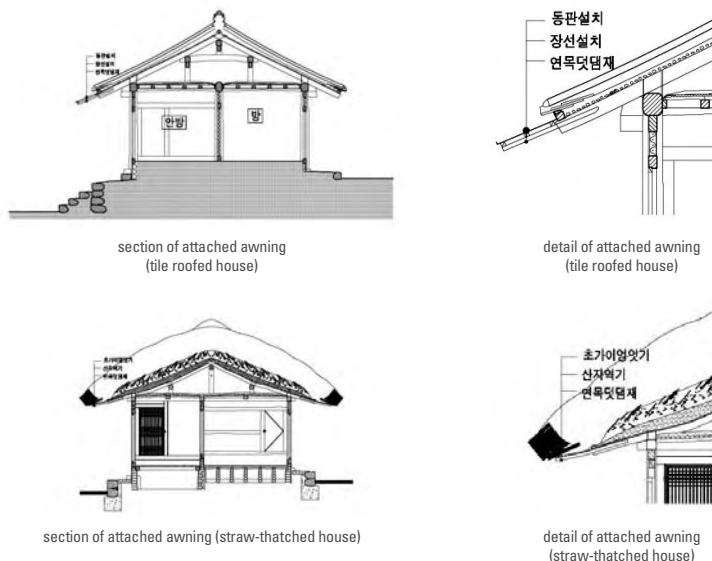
Design Guidelines for Modification of Shape and Materials (installation of awnings)
